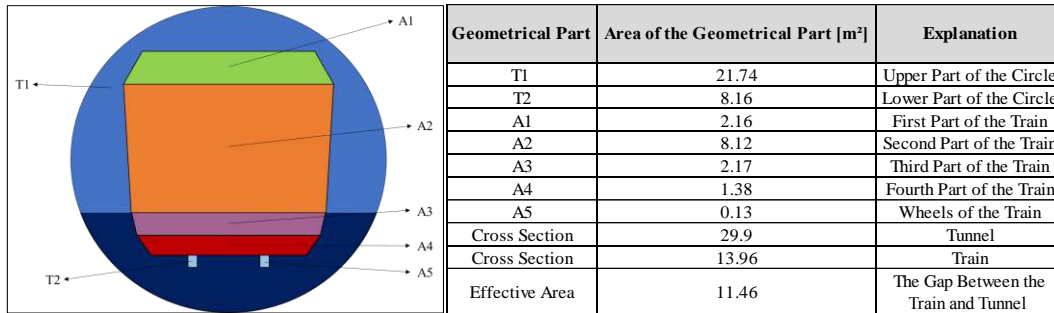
Doha Metro and Tunnel Cross Section [4]
